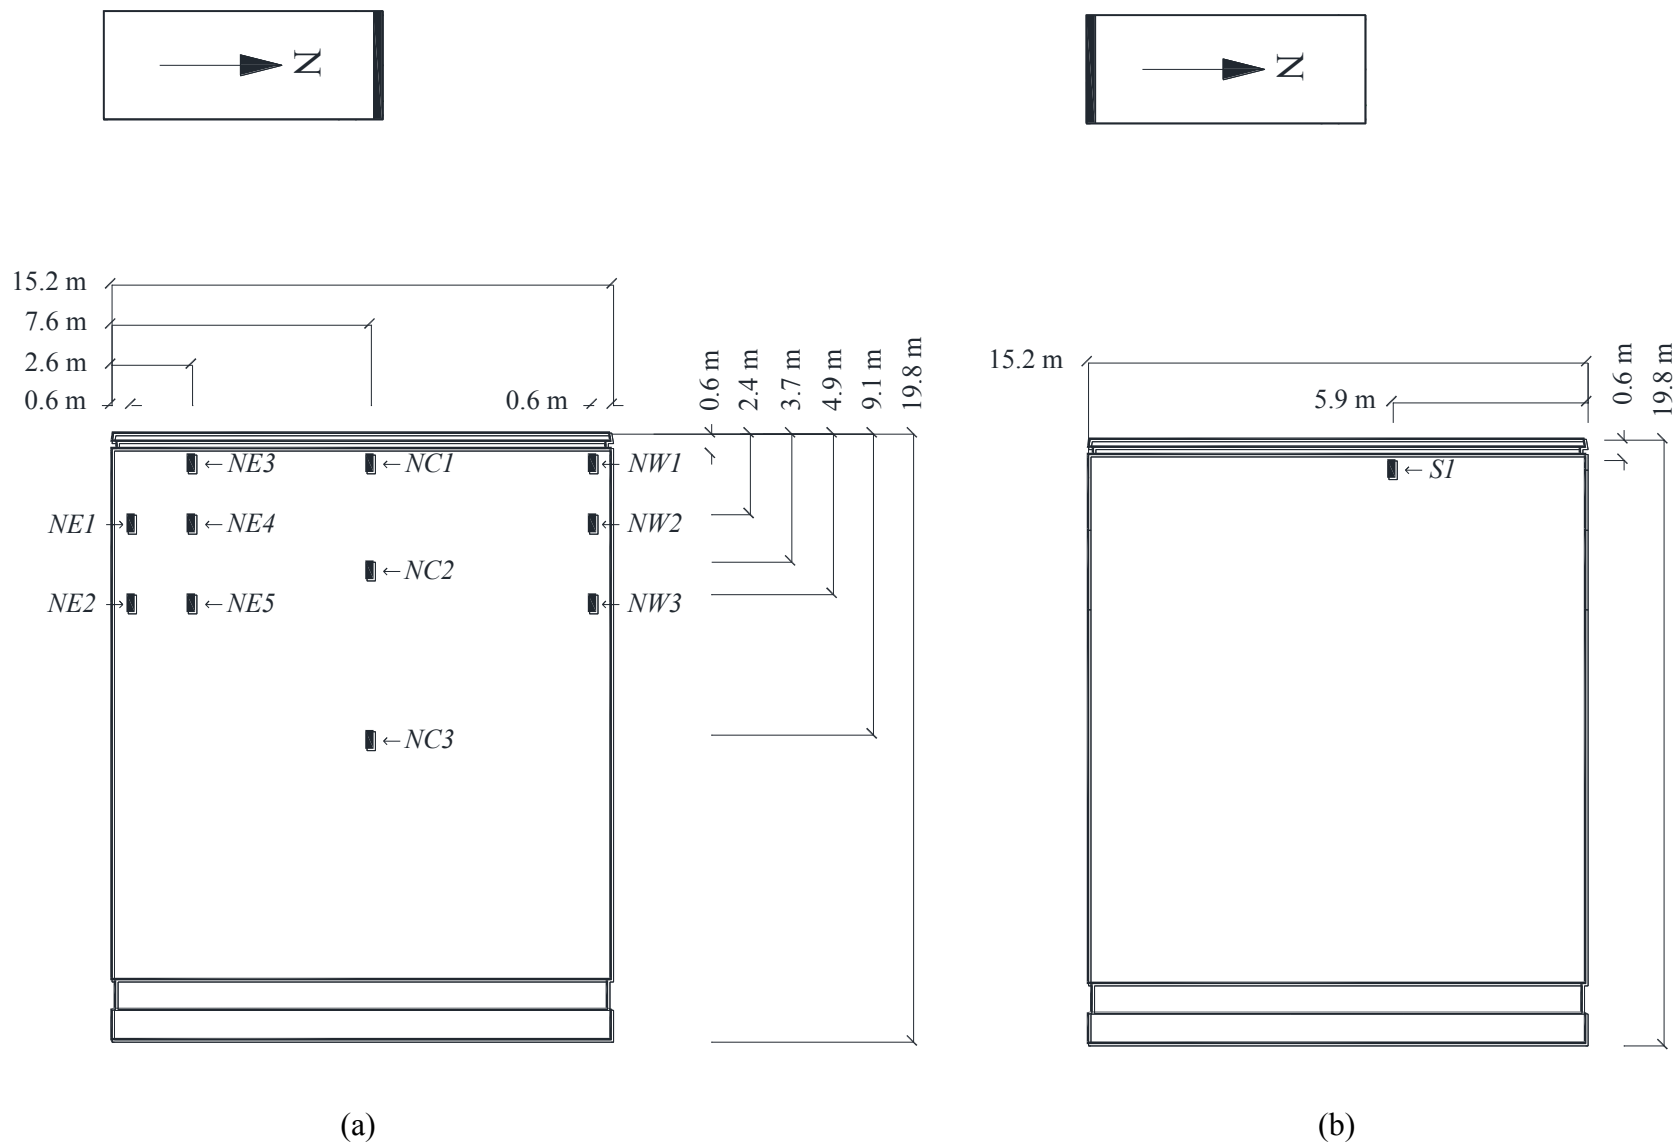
Side view of the (a) North facade and (b) South facade and their WDR gauge location(s).
